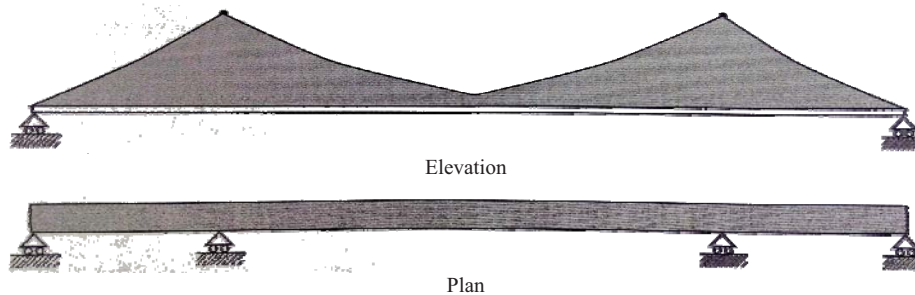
Cable supported bridge with the stiffening girder supported vertically on the end piers only, but laterally at the pylons as well as on the end piers
